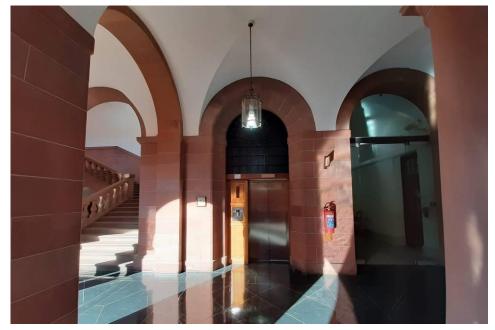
\_Passenger lift replaced on first floor level and wooden cladding put back in place without any damage
